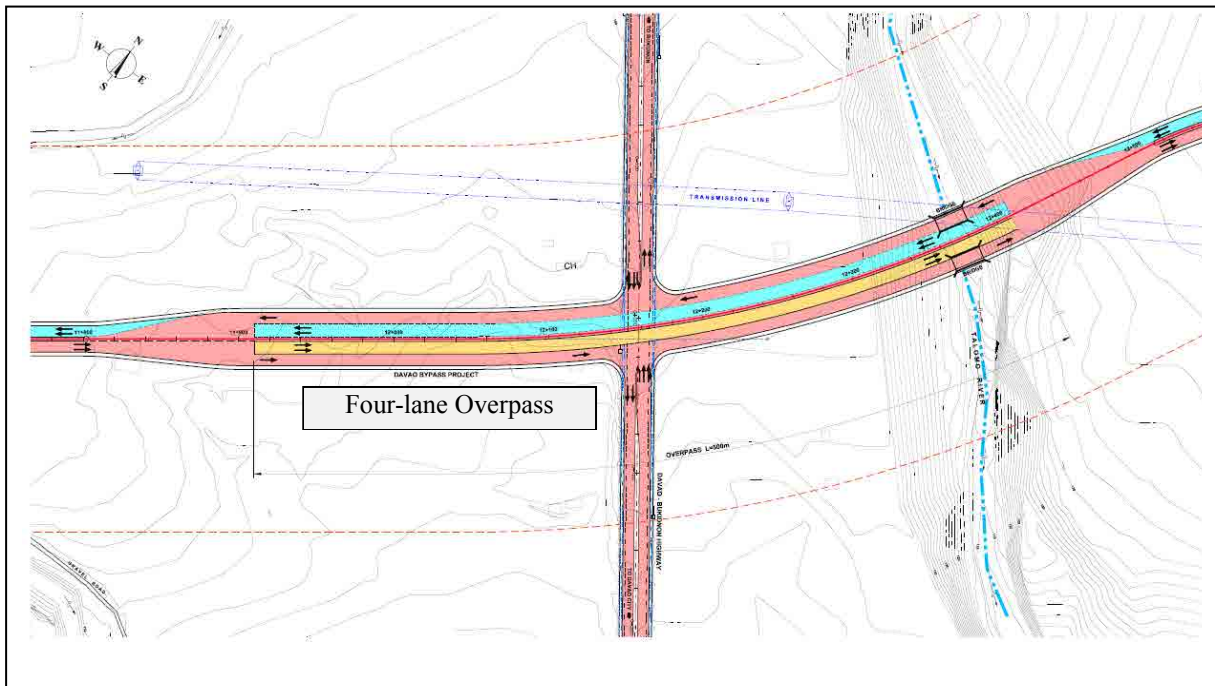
(1) INTERSECTION OF MAHARLIKA HIGHWAY (46+600)
